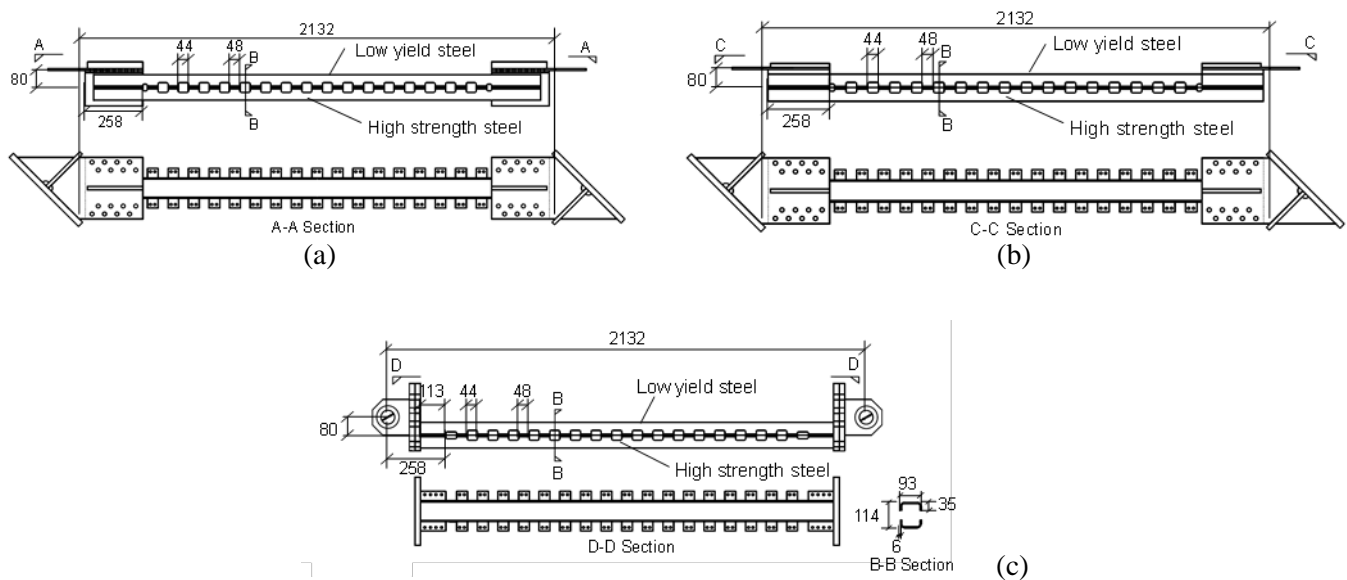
Dimensions of all specimens: (a) G-K; (b) G-B; (c) P-E
